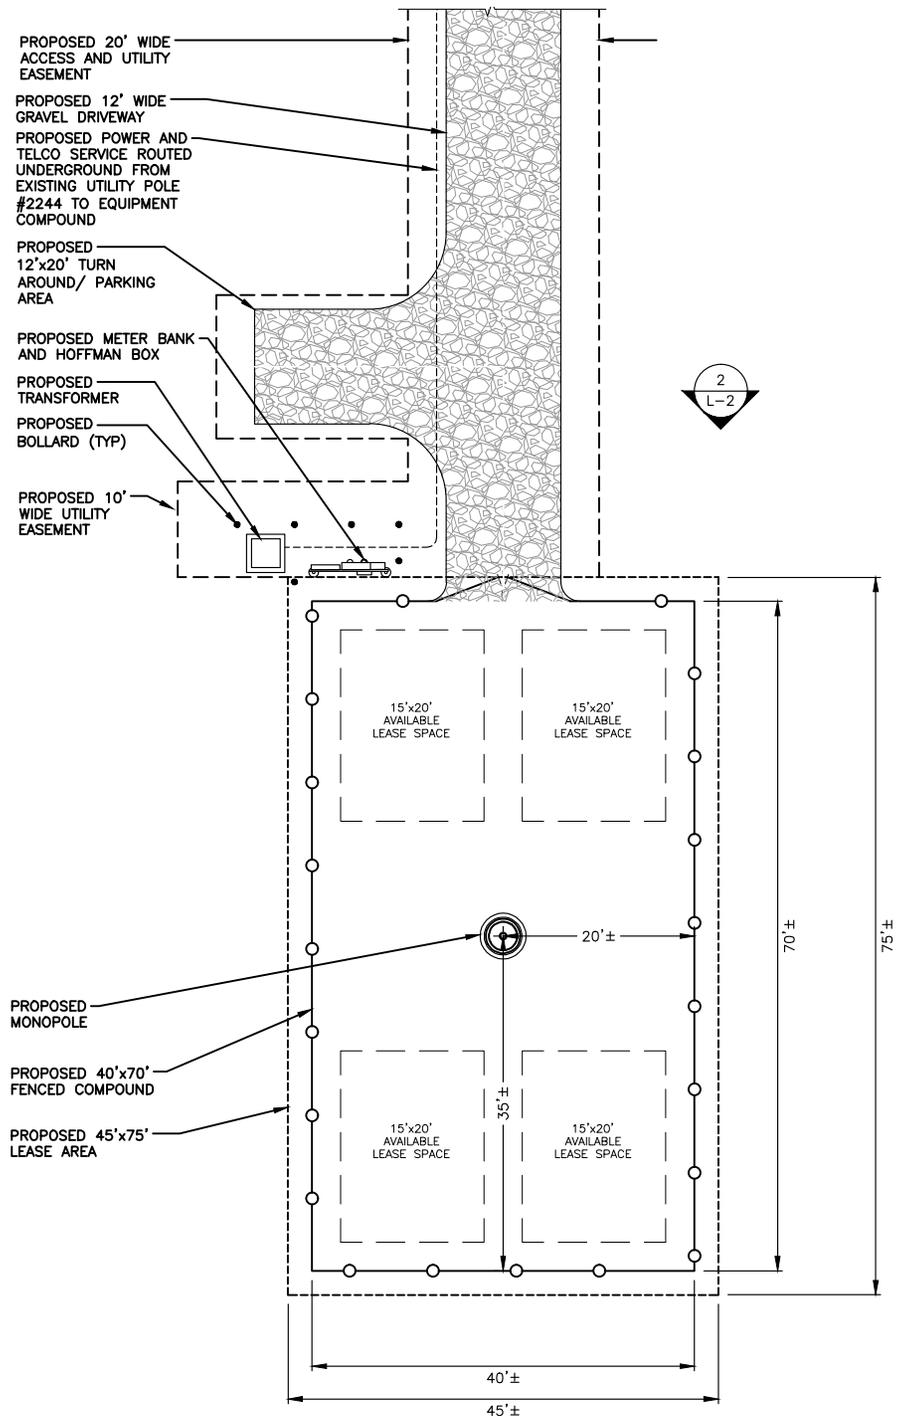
PROPOSED EQUIPMENT LOCATION PLAN
